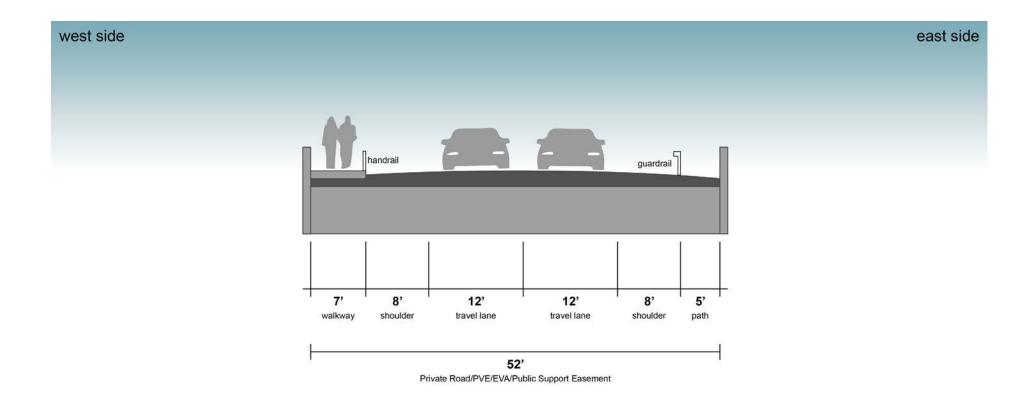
SECTION K: VILLAGE EAST ROAD BRIDGE
